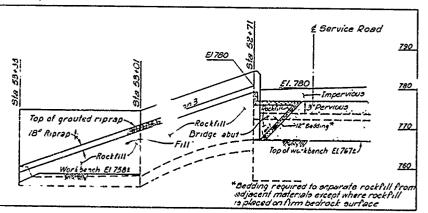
DETAIL OF SIDE-HILL DRAINAGE CHANNEL LOOKING DOWNSTREAM
